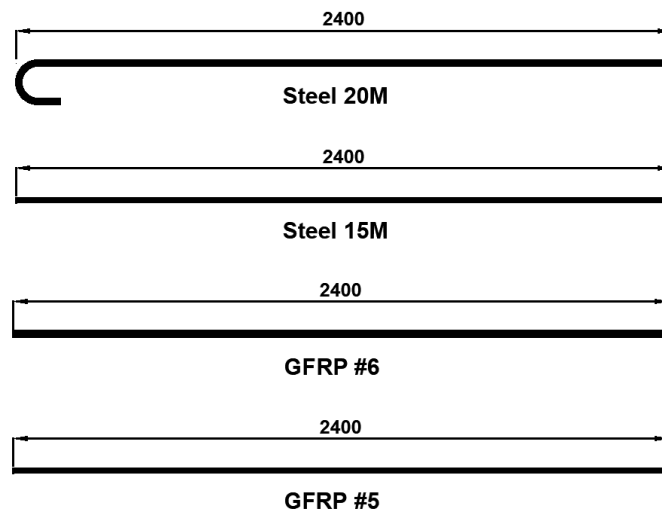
Deck slab reinforcement layout. All dimensions in mm.
